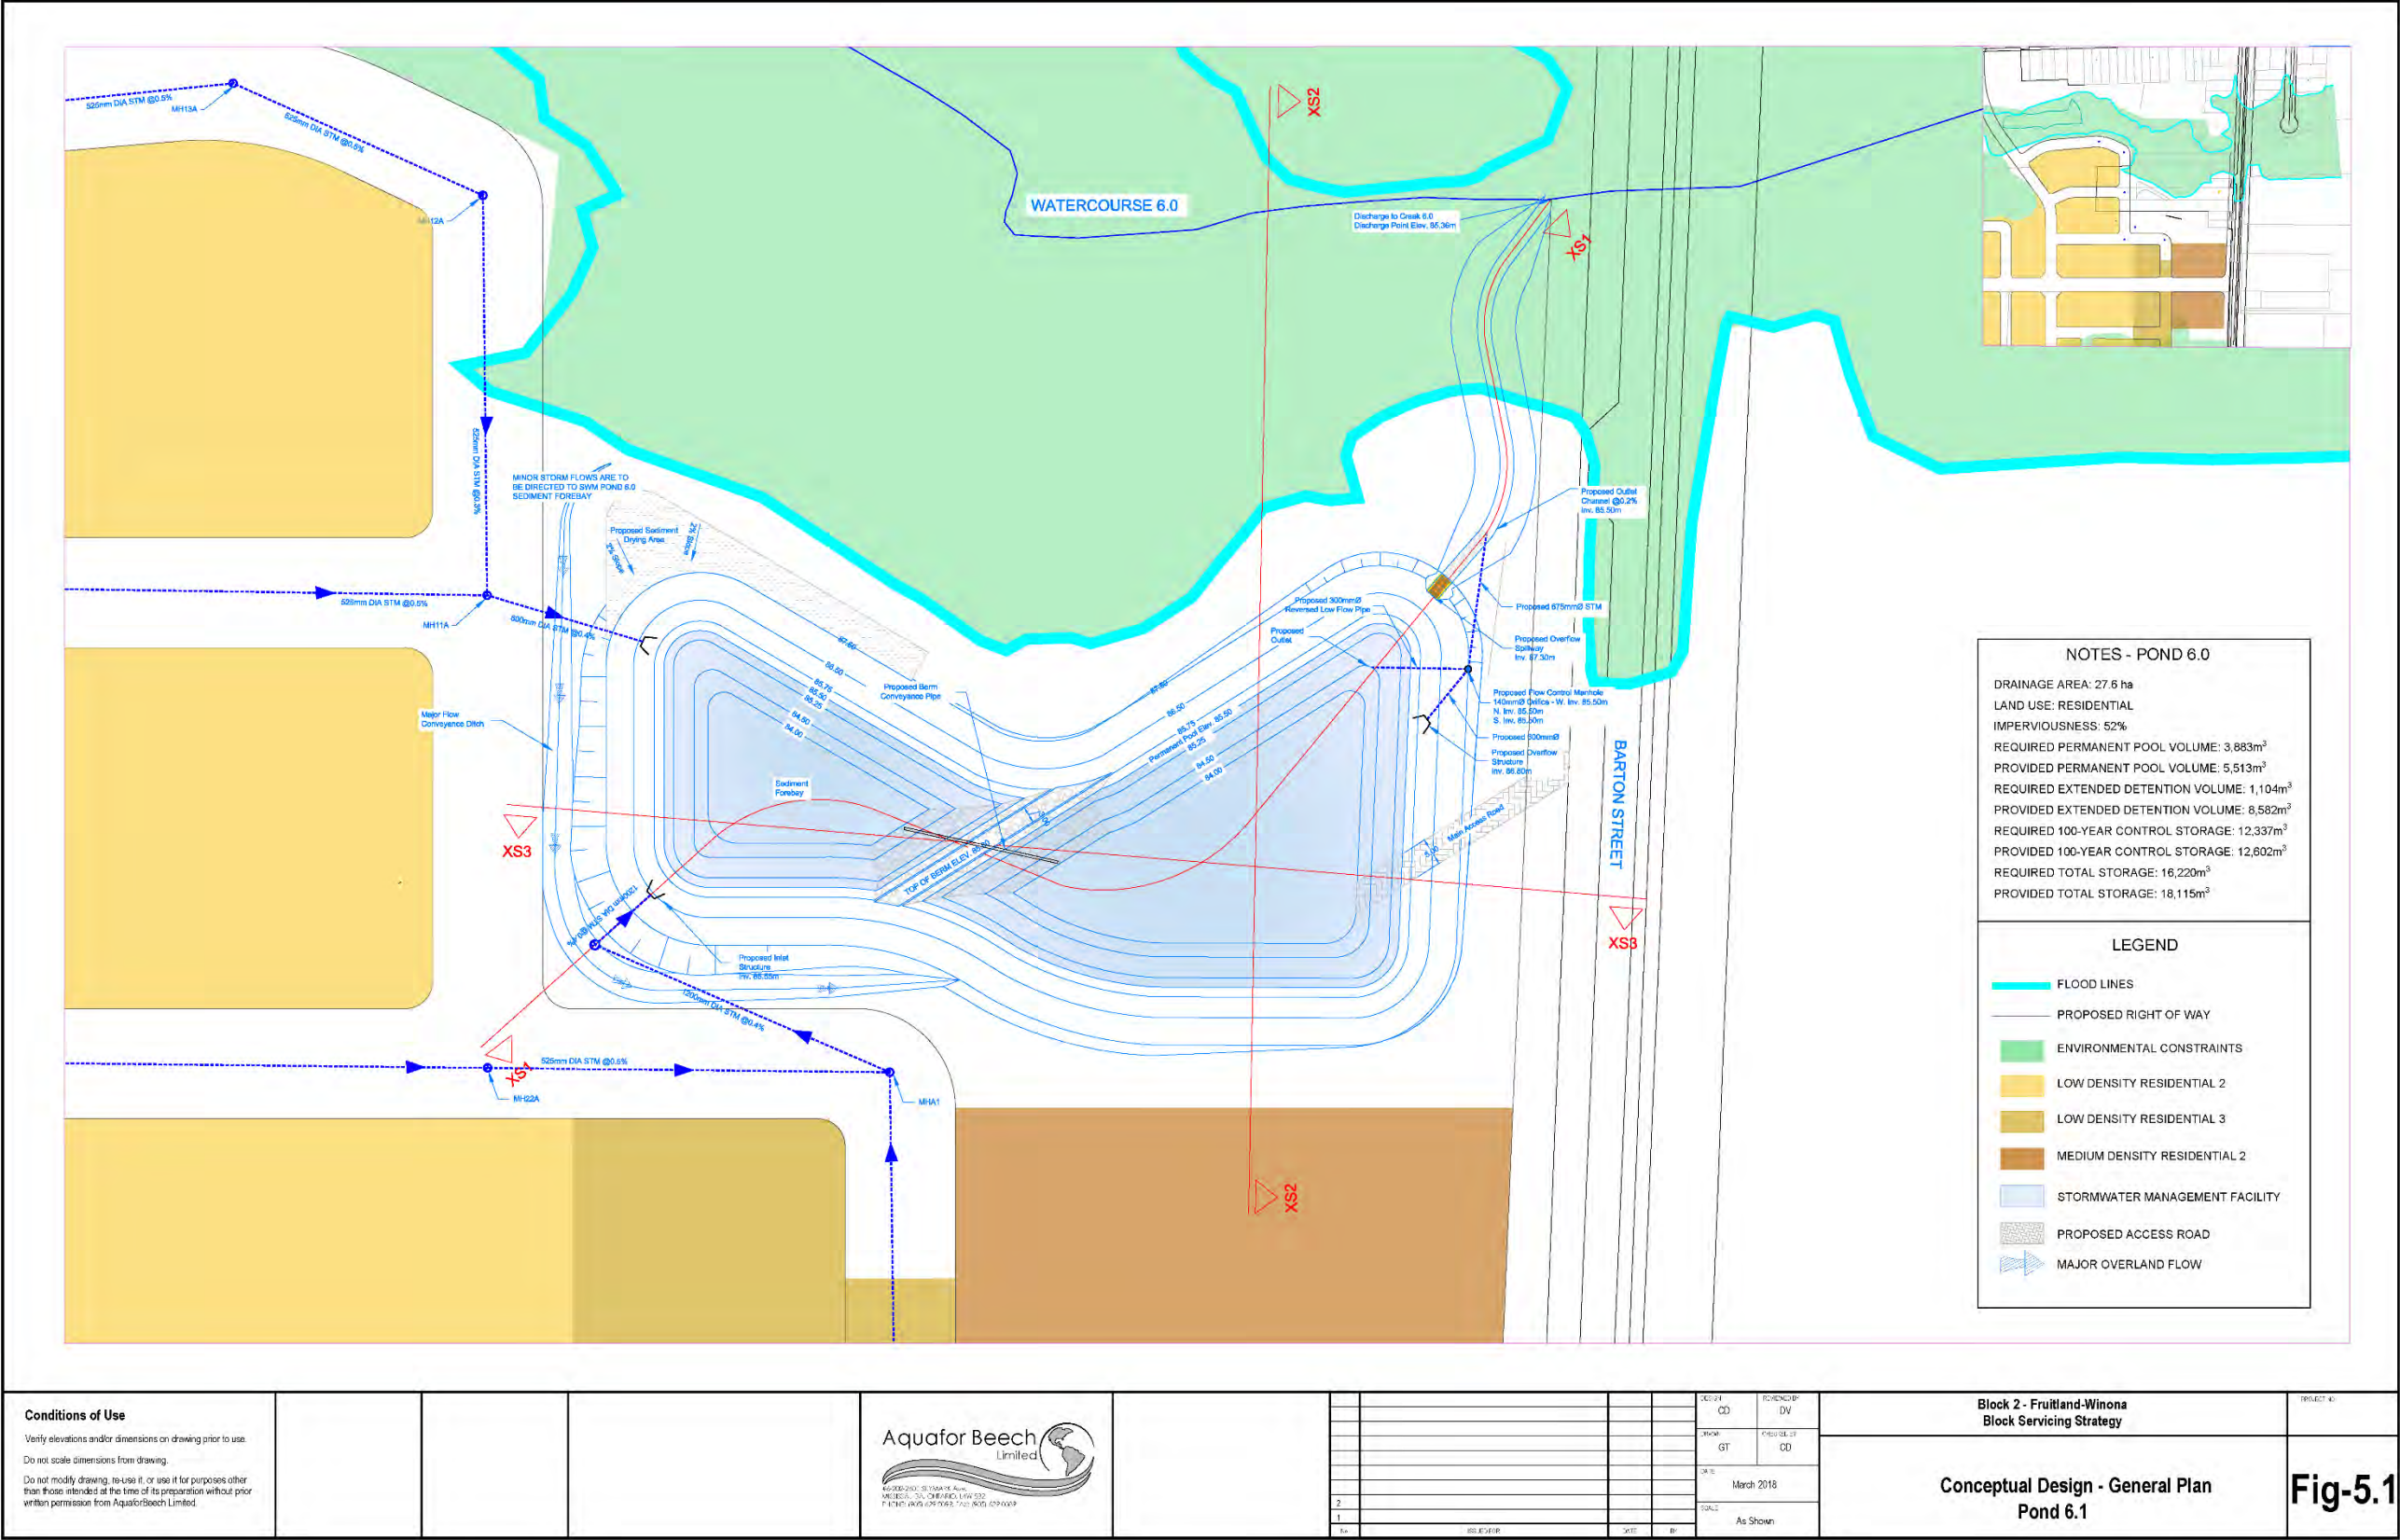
Pond 6.0 Conceptual Design – Plan View
